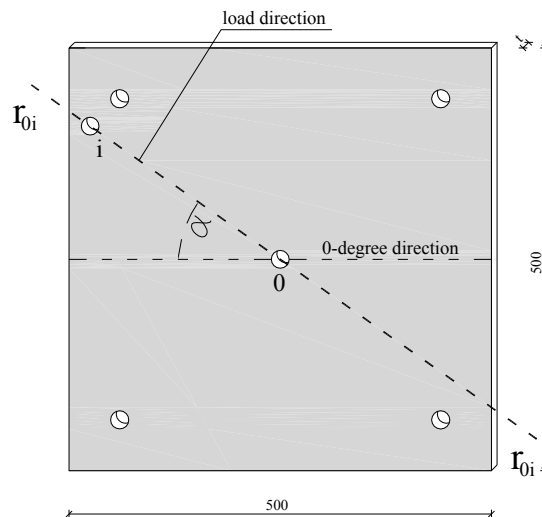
GFRP specimen: geometry (dimensions in mm).
